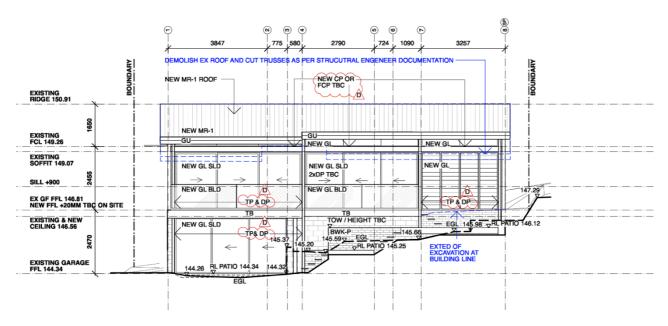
CDC West (Rear) Elevation Jones Street, Beacon Hill
